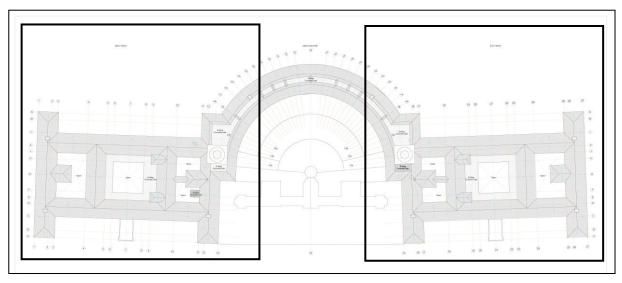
\_Union Buildings\_Roof Plan – West and East Wing (Source: Drawing Ikemeleng Architects, 2017)
